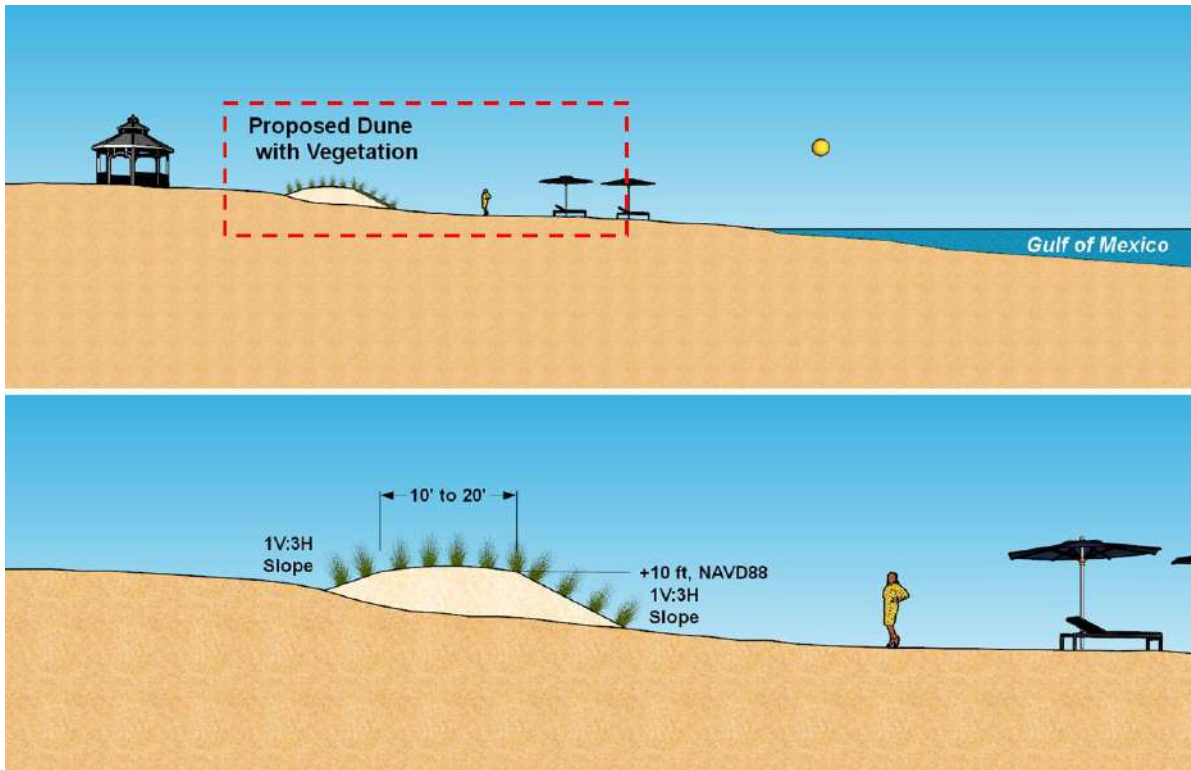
Typical Type C Dune overview (above) and detail view (below).
